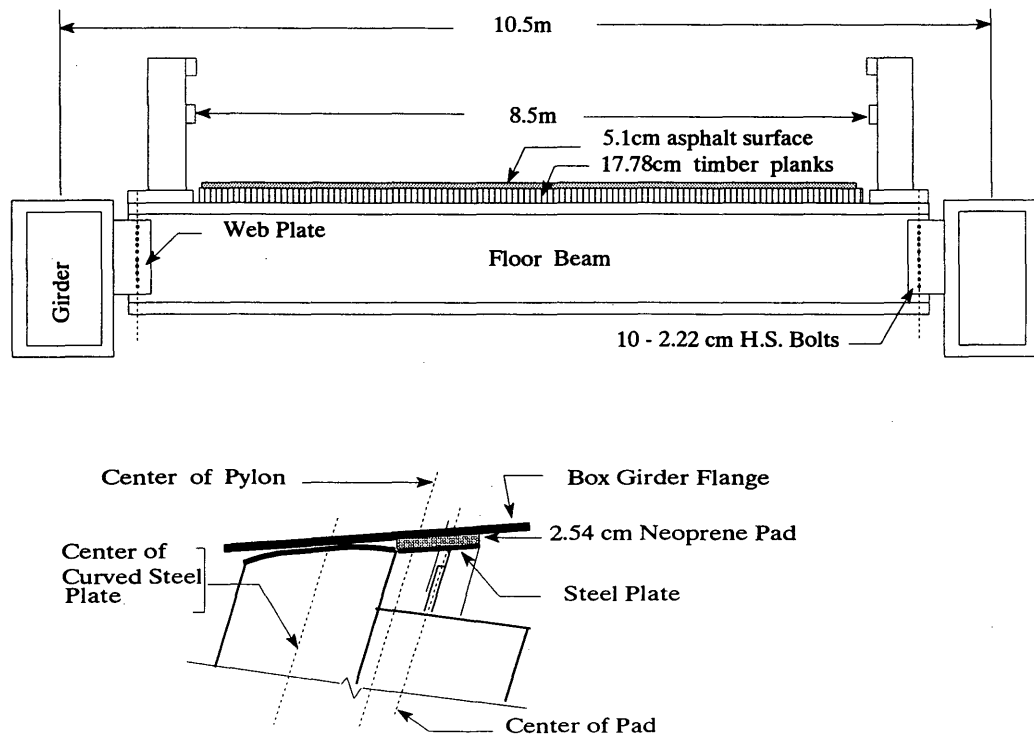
Bridge section geometry: *top*, bridge section; *bottom*, pylon bearing pad.
